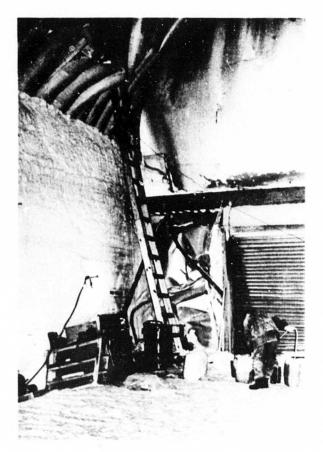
Effects of snow load are visible on Trench 33's deformed arch, end wall and access ladder.
